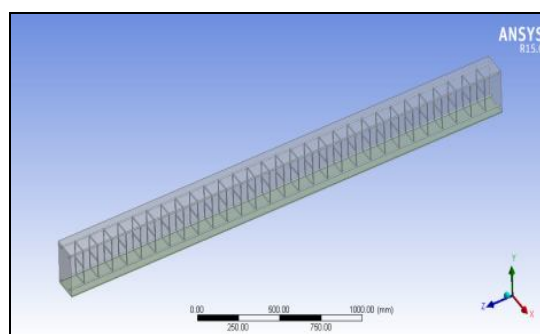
RCC beam 100mm bar spacing with cellular stirrups & 5mm GFRP laminated
